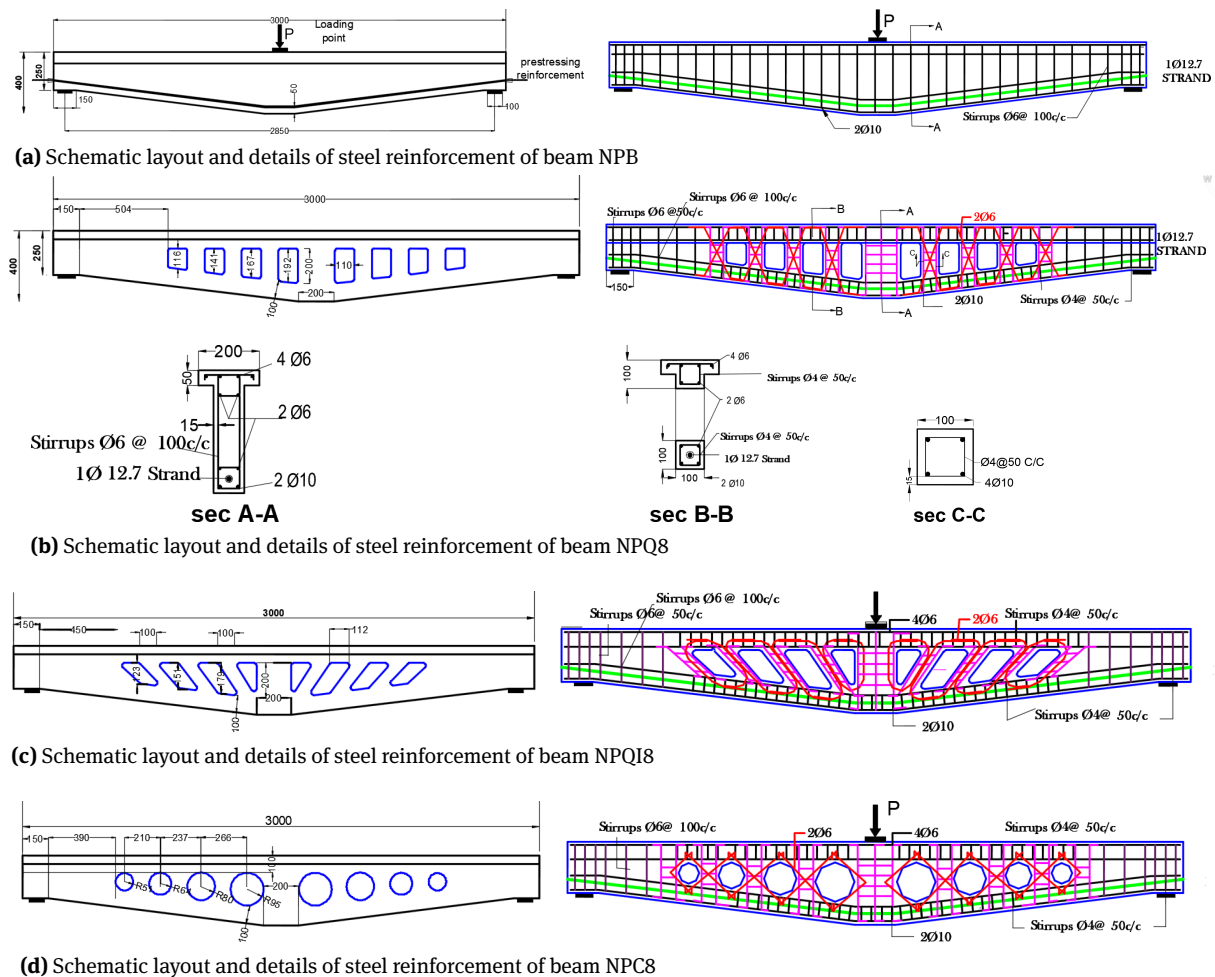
Schematic layout and details of steel reinforcement for all specimens. (Note: All dimensions in mm)
